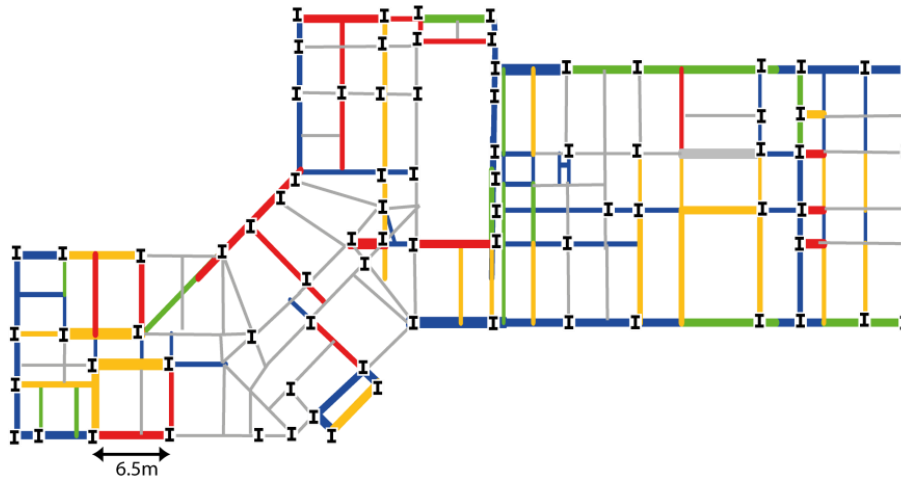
plot of floor showing beams coloured according to utilisation ratio (as per legend pg. S2)
